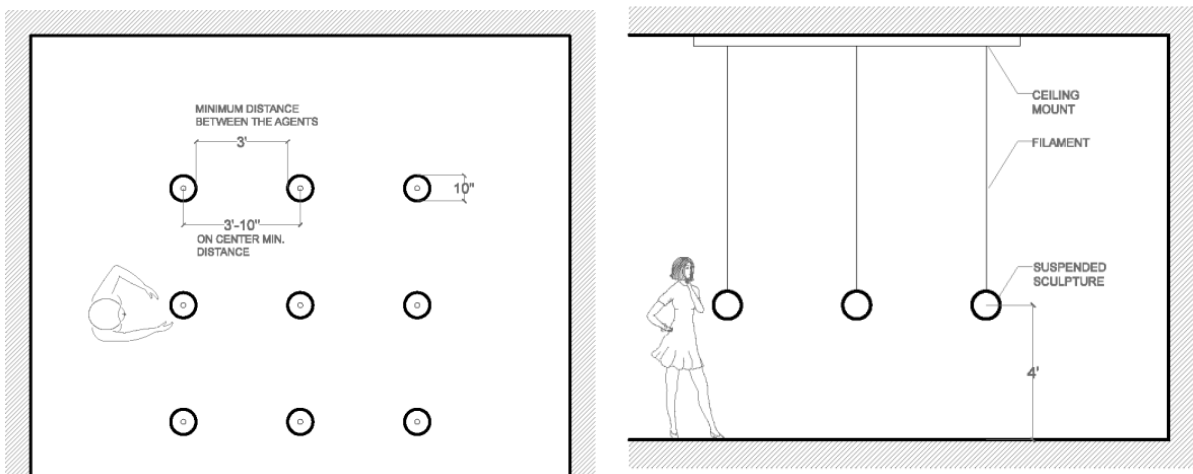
Installation Floorplan (Sölen Kiratli)
